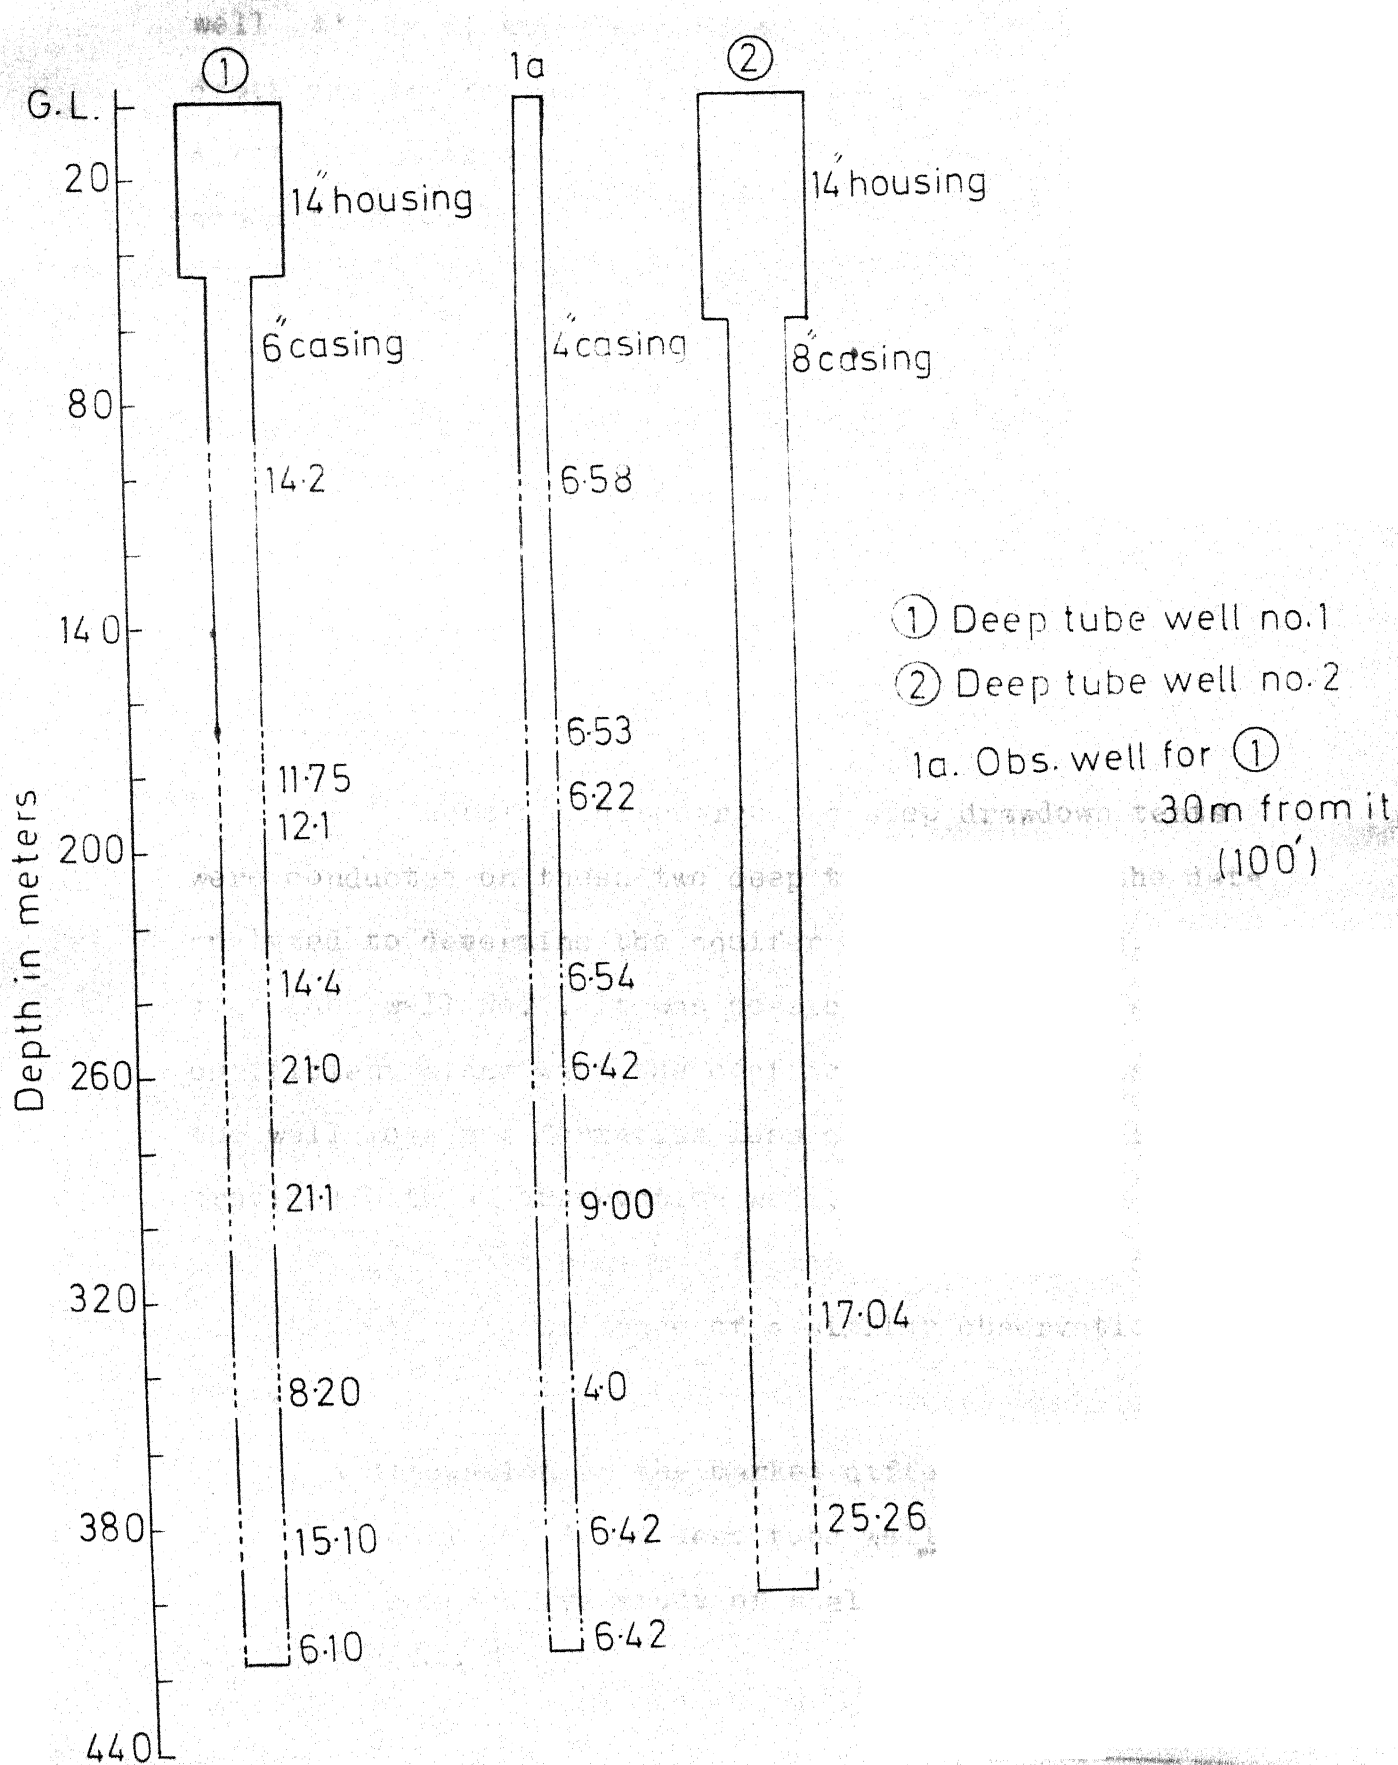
ASSEMBLY DETAILS OF DEEP TUBE WELLS OF I.I.T.
